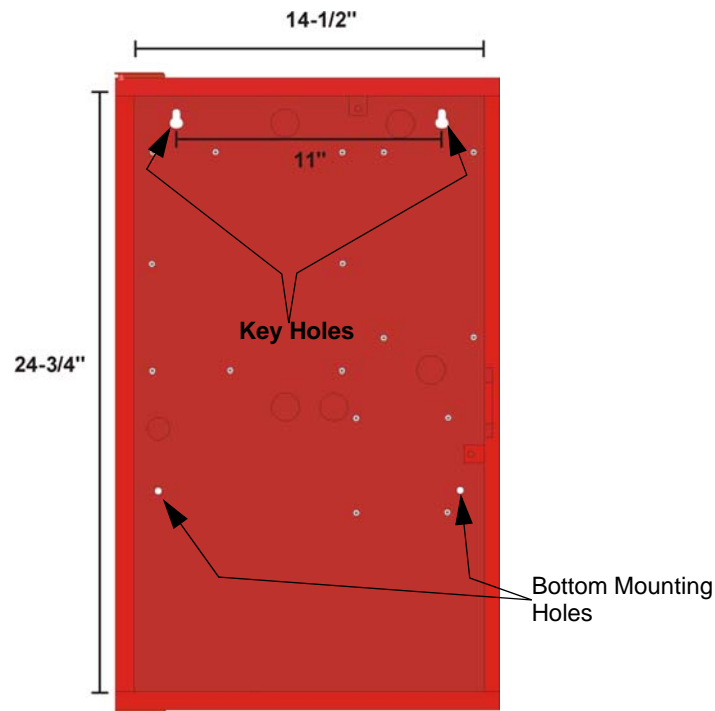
Cabinet Flush Mount Dimensions and Mounting Hole Locations
